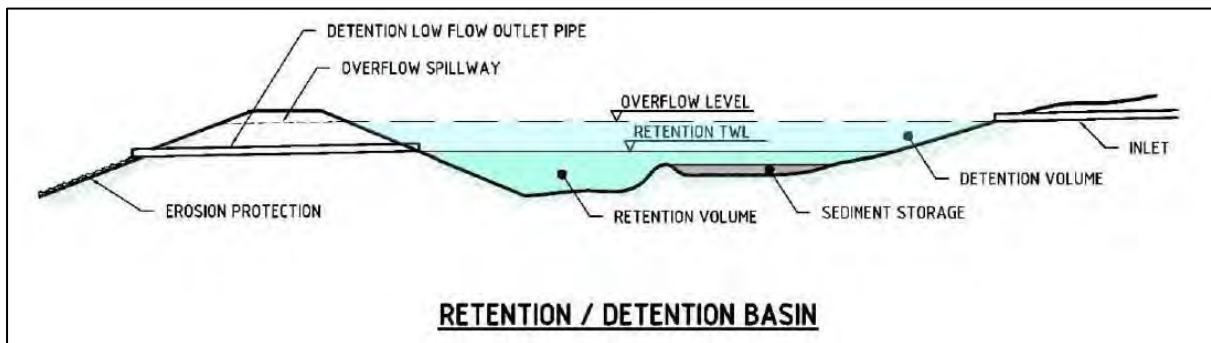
| CROSS SECTION OF A TYPICAL RETENTION/DETENTION BASIN SUCH AS THAT PROPOSED AT BIH (APPENDIX 13)
